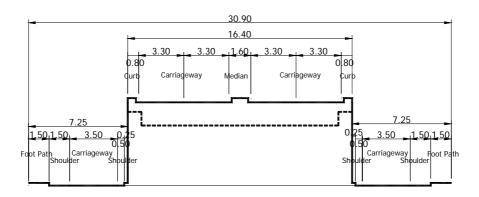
Proposed Cross Section (Ramp Wall/Flyover)
